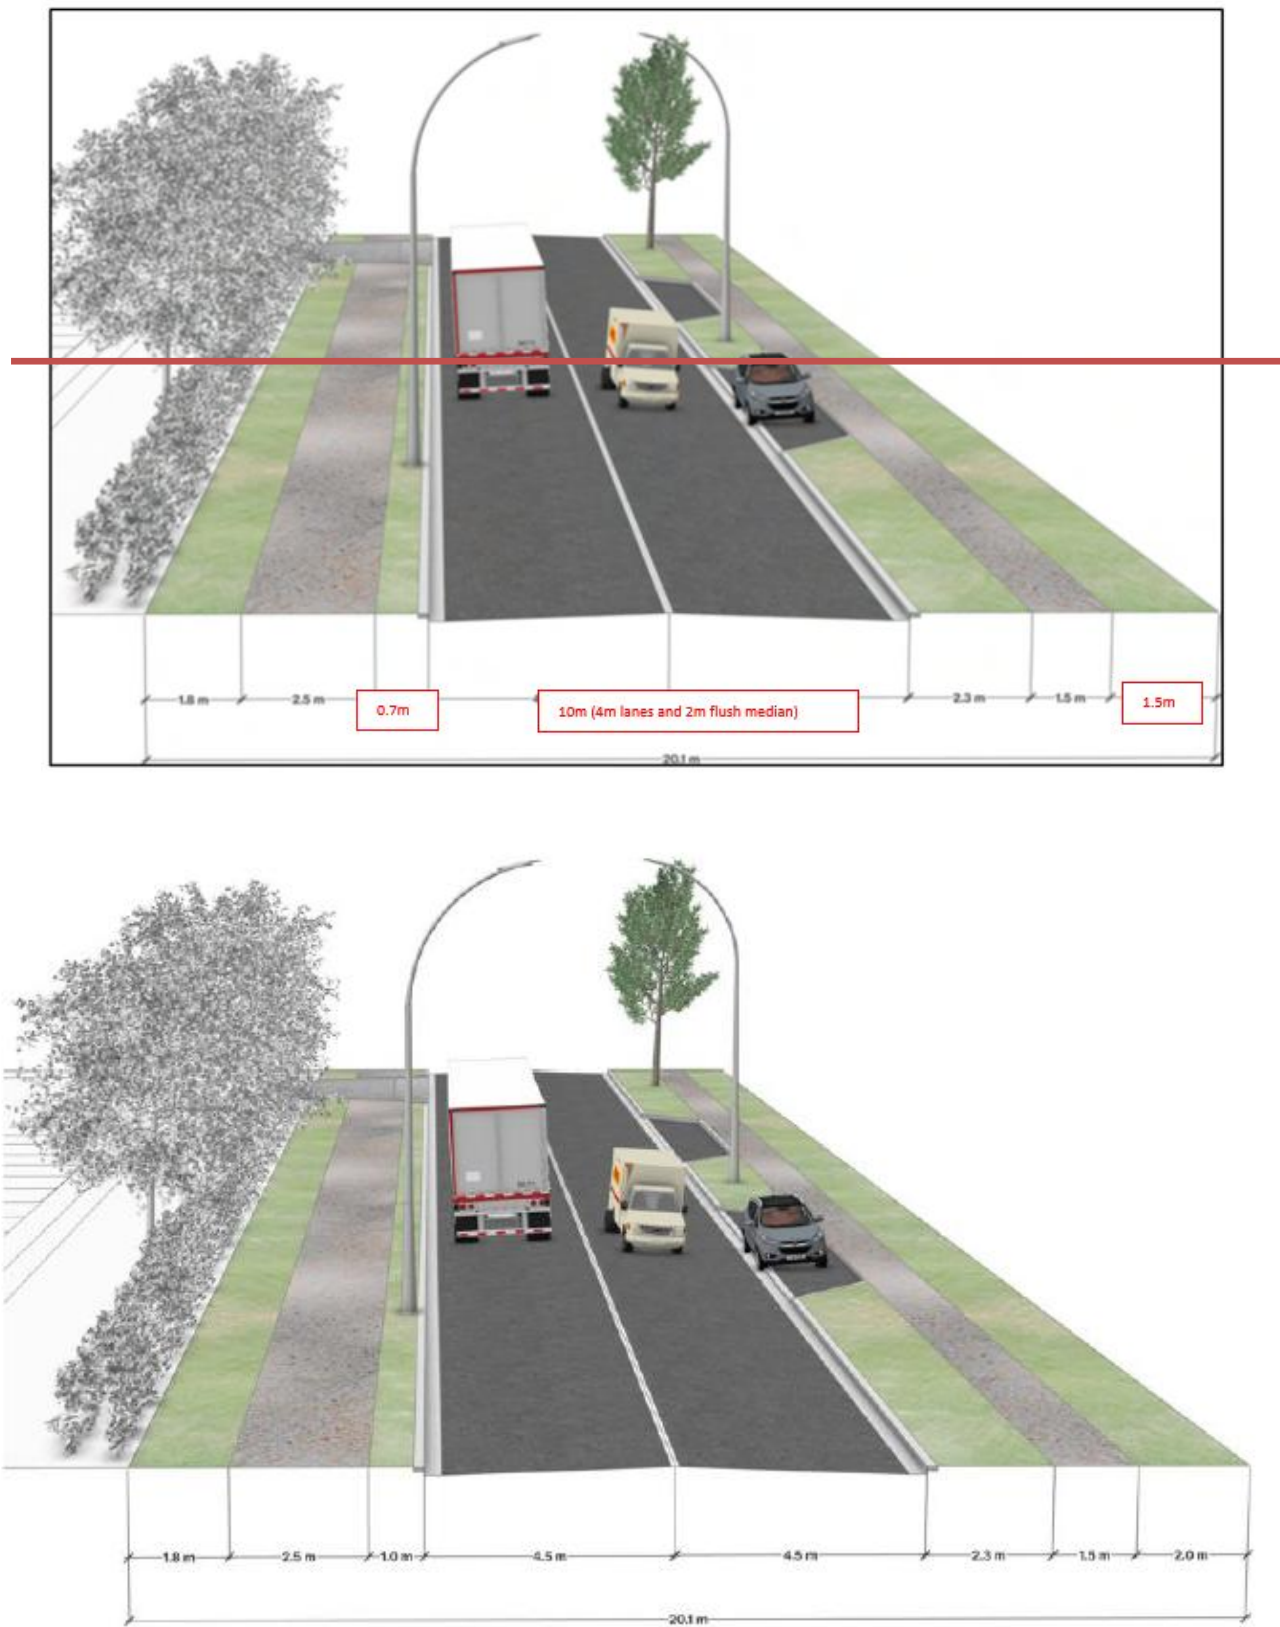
e: Indicative Old Ruffell Road upgrade cross section ([Collector](#))
